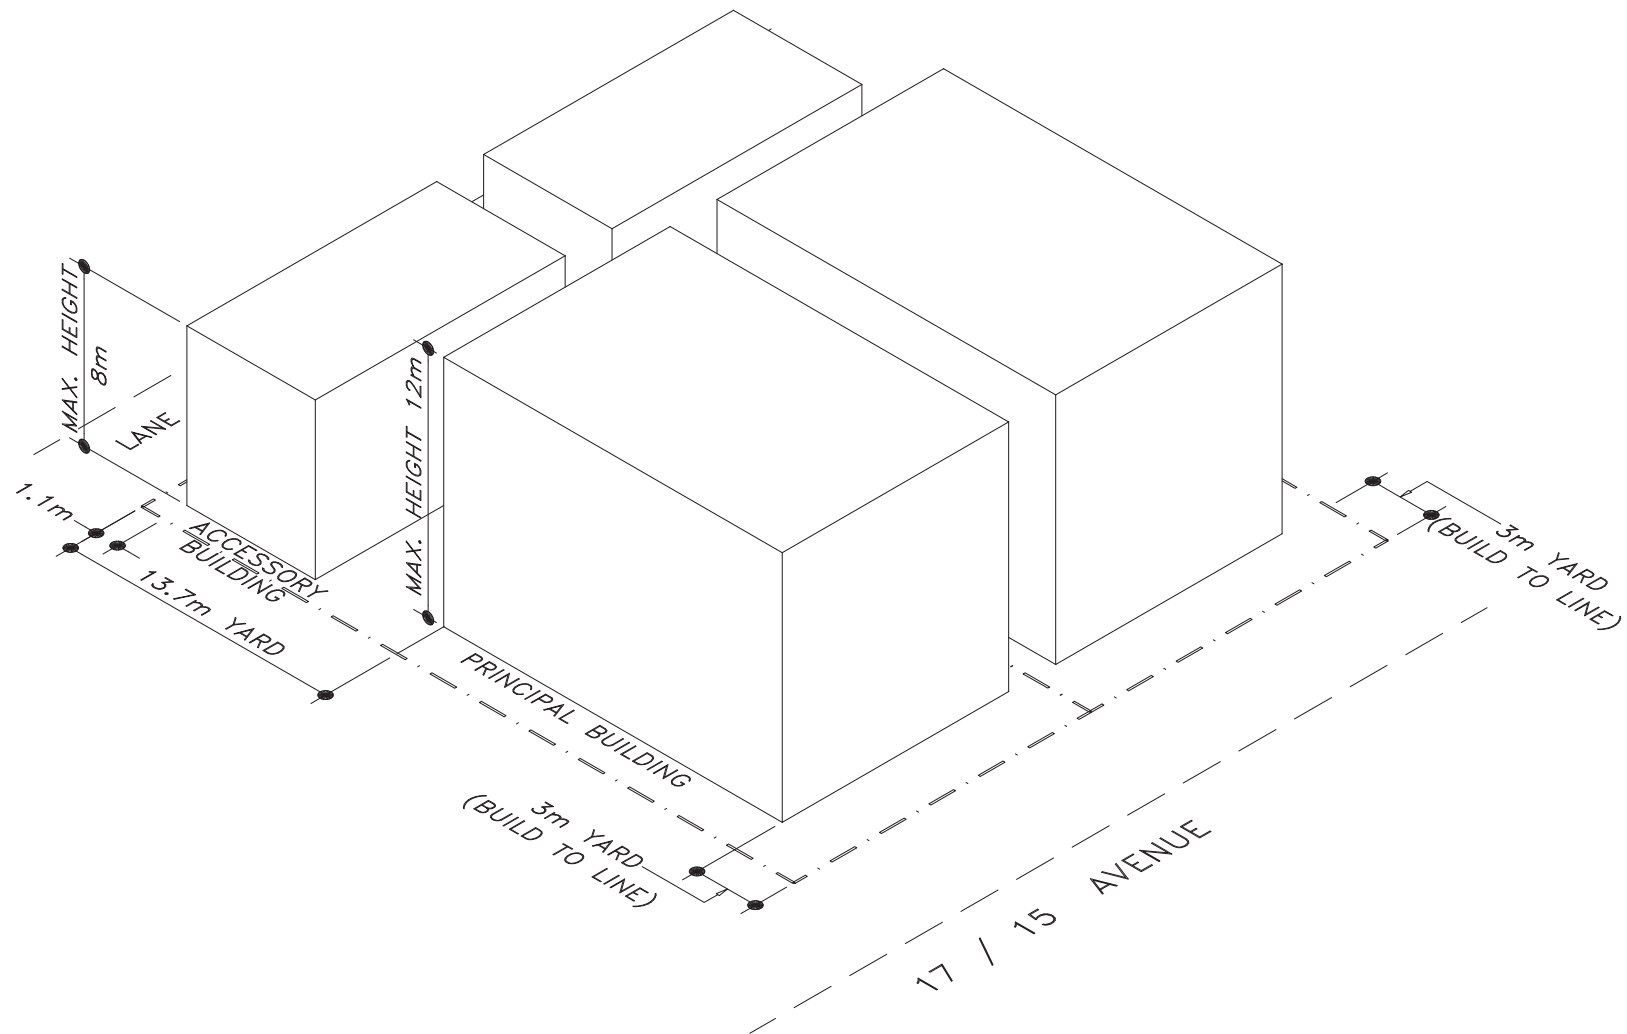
Building Form Example – Multi-residential/Carriage Houses
